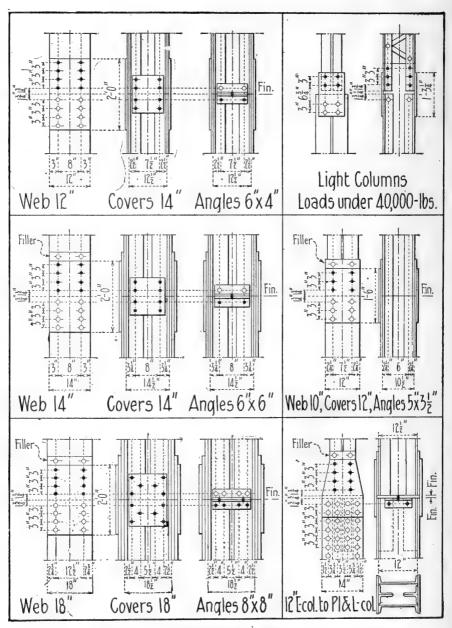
DETAILS OF COLUMN SPLICES. AMERICAN BRIDGE COMPANY.
